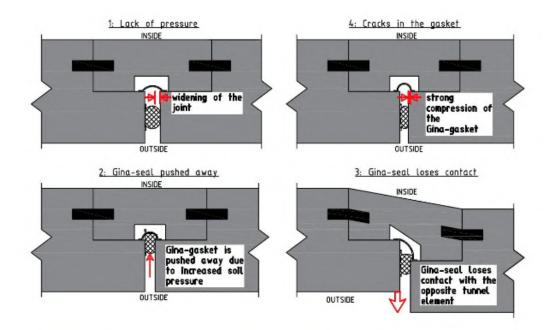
Failure mechanism of Gina gasket (Van Montfort, 2018)
